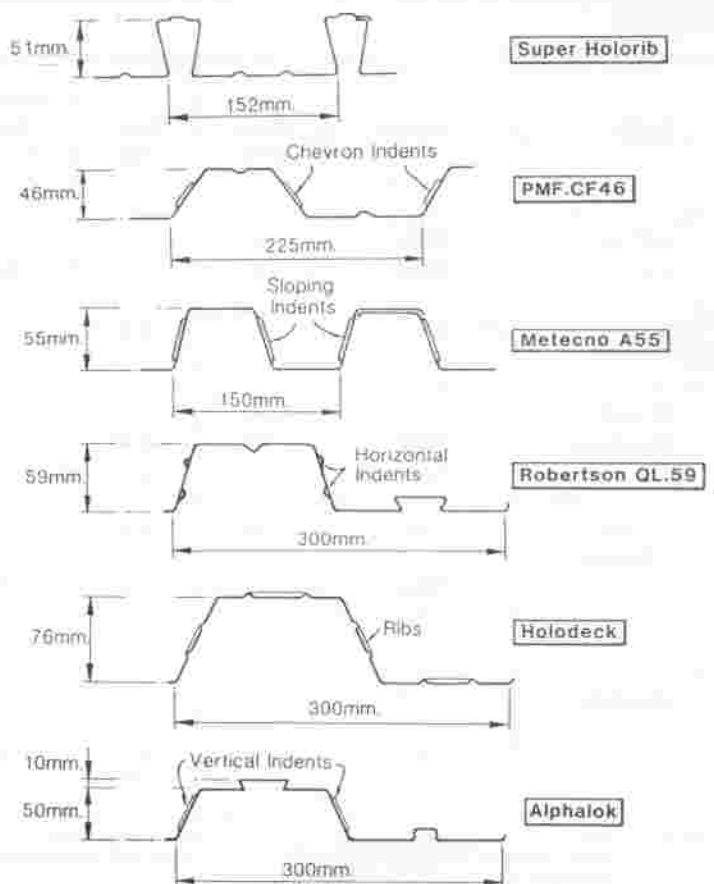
Profiles used in composite deck slabs subject to fire tests in the UK
